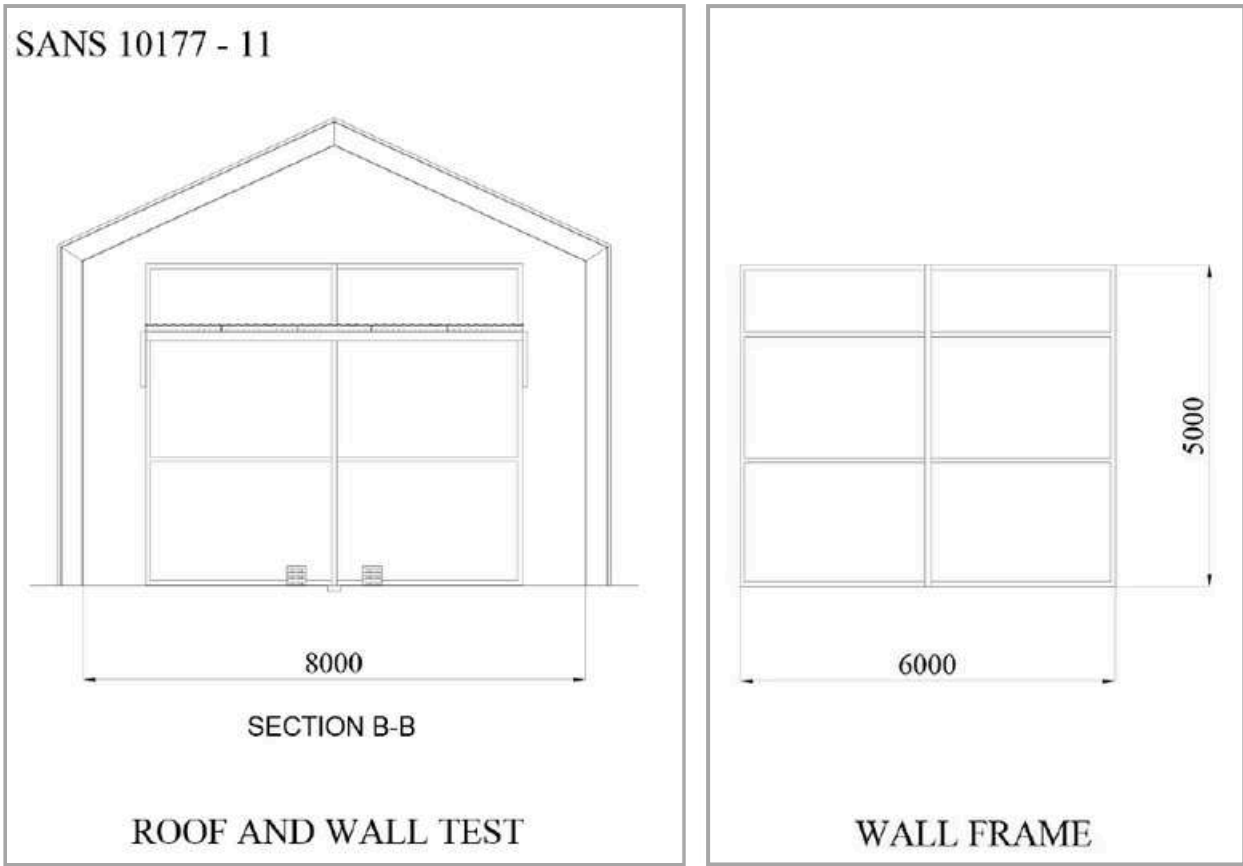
Typical side-cladding installation in SANS 10177-11 facility
